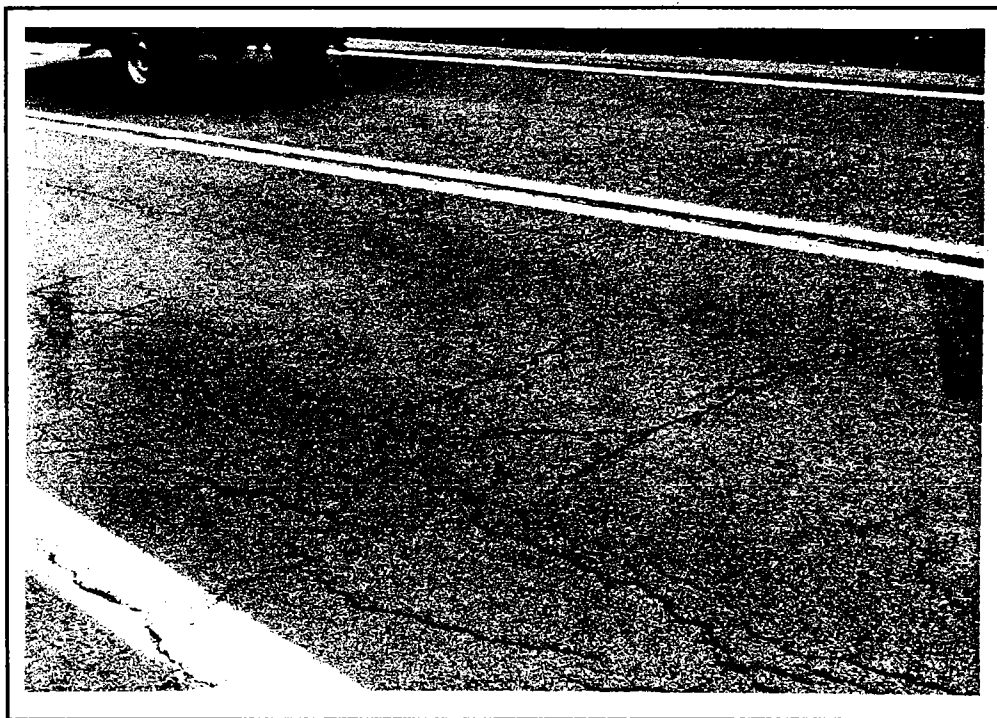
Typical pavement with untreated aggregate, 6A gradation foreground, 7A gradation in background (the shoulder was not part of the test).
